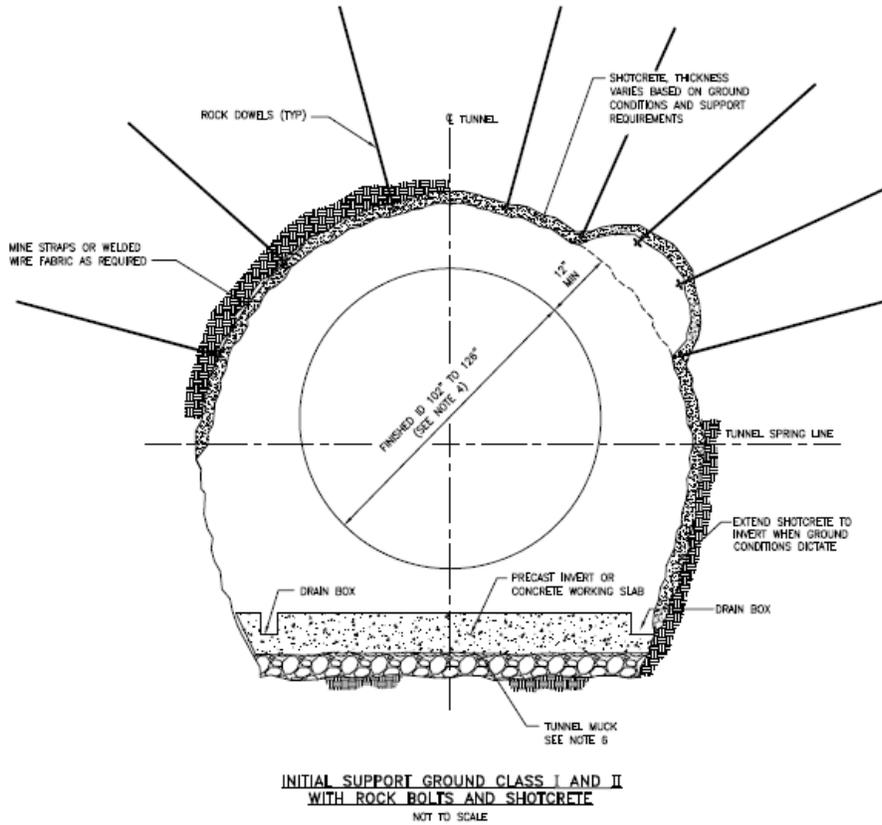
Typical horseshoe-shaped drill-and-blast tunnel
